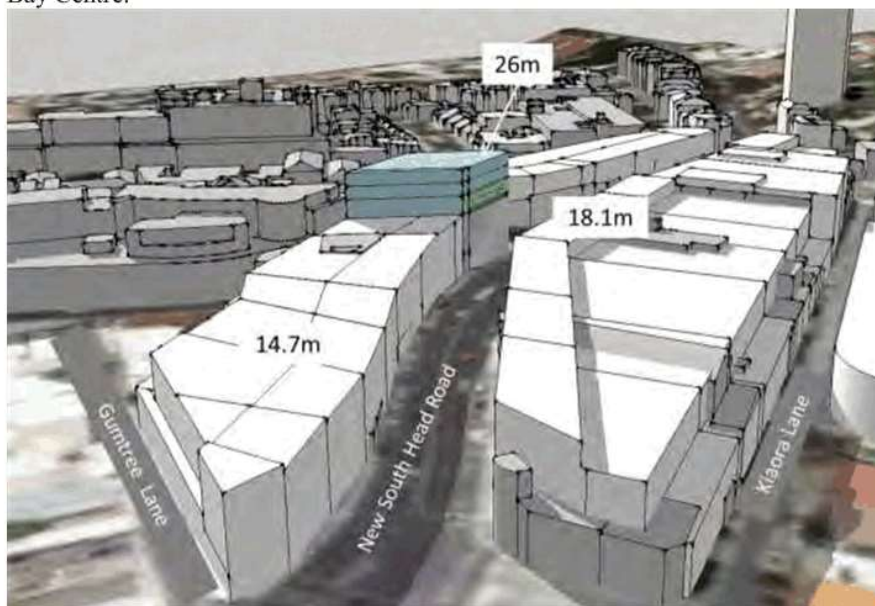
Council's 3D model of existing building envelopes on the north and south side of New South Head Road and the proponent's proposed building envelope.
